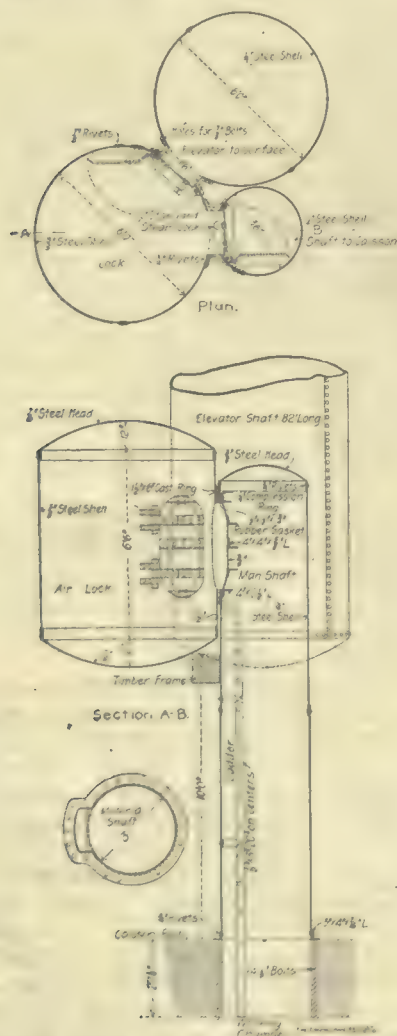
PLAN AND ELEVATION OF SHAFT AND AIR LOCK.
